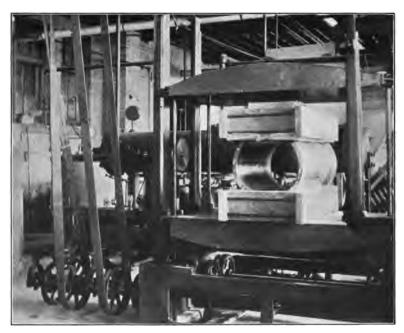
Fig. B.—Power testing machine used to determine crushing strength of pipe. (Facing Page 158)
